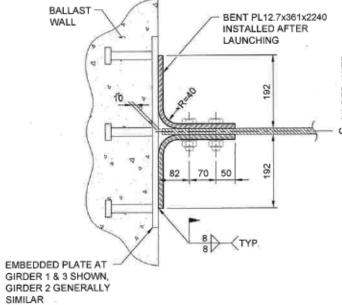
20 BALLAST WALL CONNECTION ANGLE
